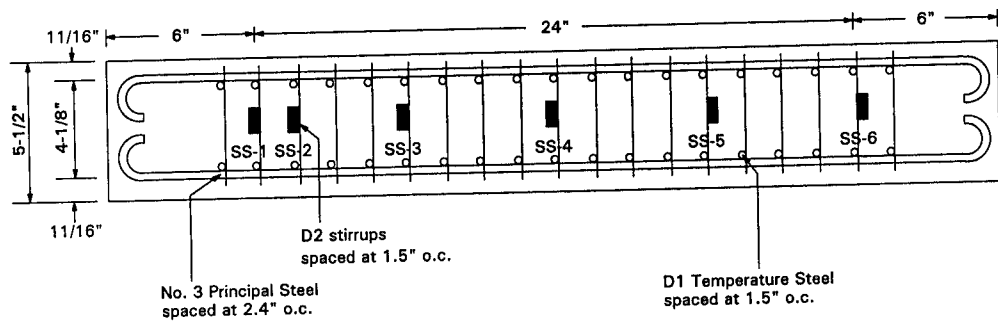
Strain Gage Locations on Stirrups in Slab No. 2
